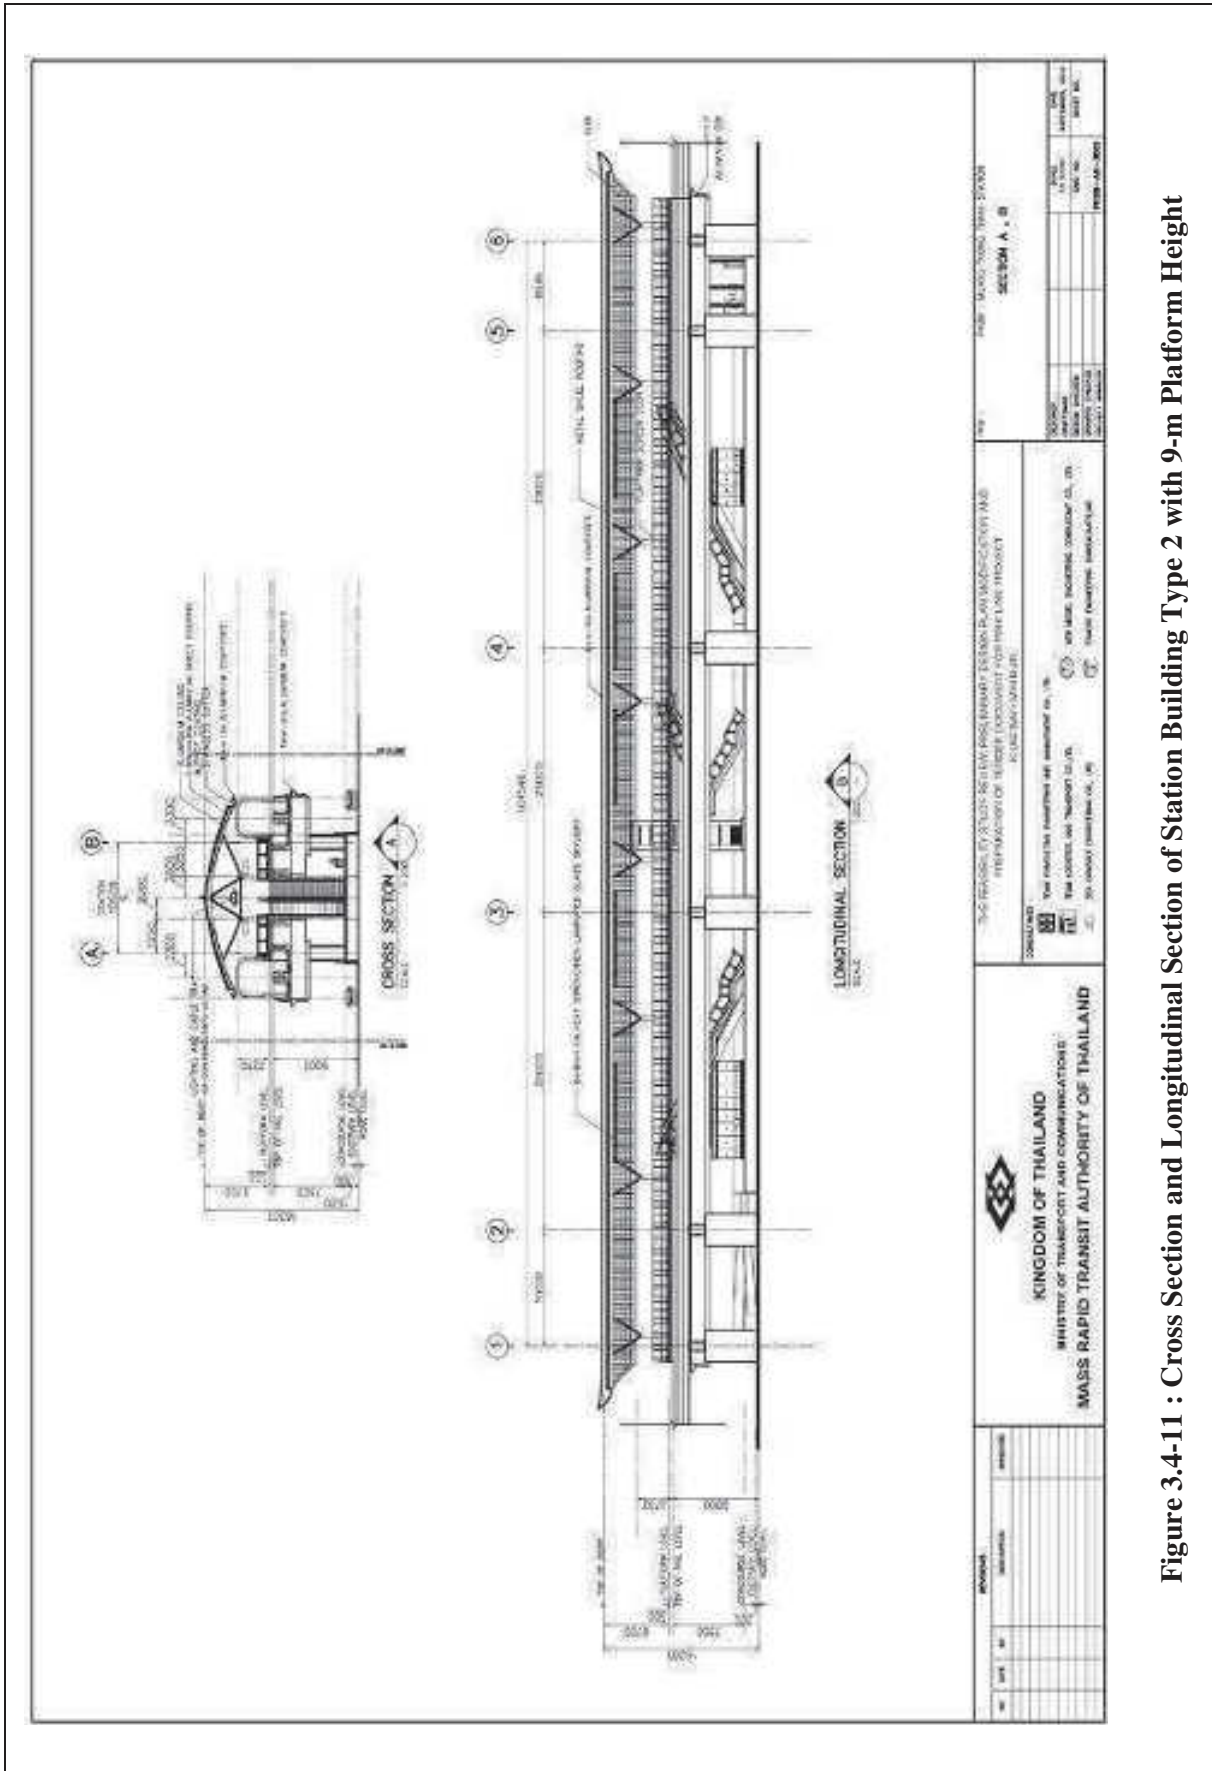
Cross Section and Longitudinal Section of Station Building Type 2 with 9-m Platform Height
